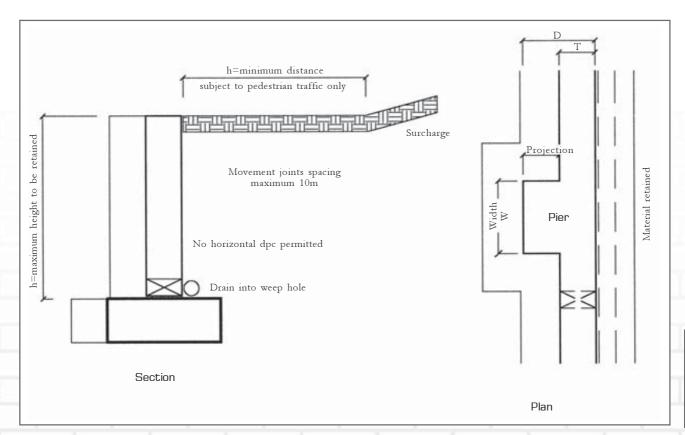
Retaining walls (HBM Part 2, Section 3, Figure DM13)
